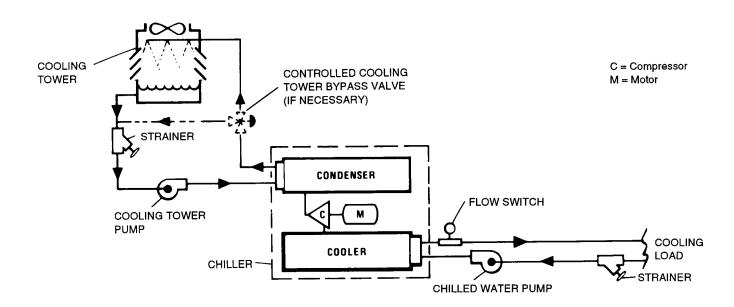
SCHEMATIC OF A TYPICAL PIPING ARRANGEMENT
